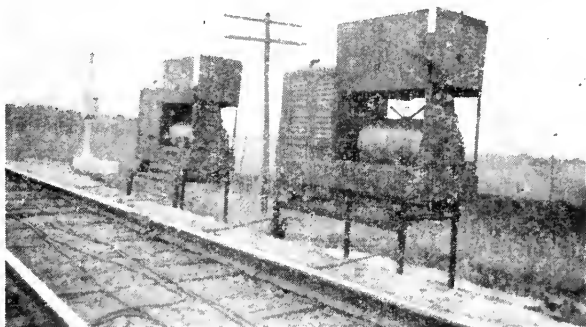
Track-Mounted Quick Take-off Machines For Train Passage.
